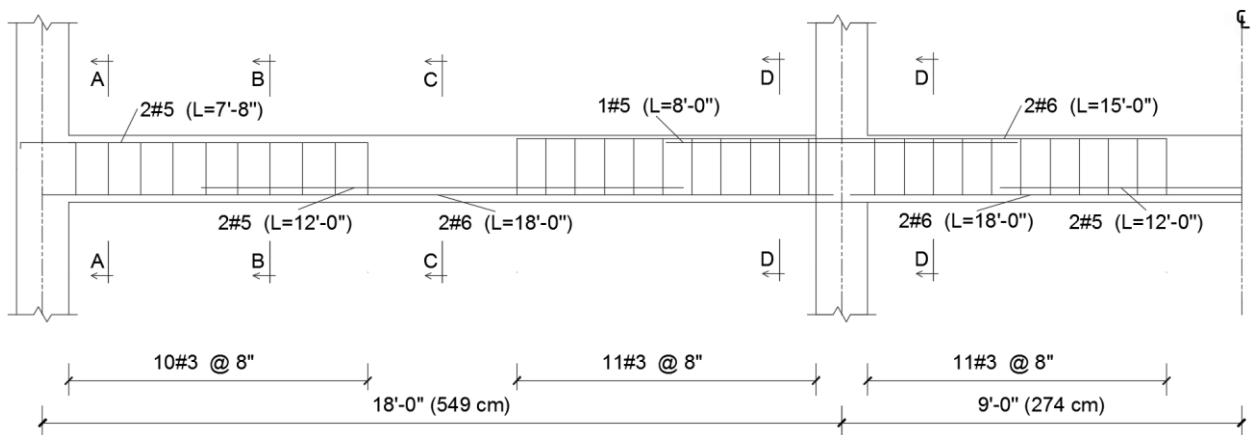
Beam reinforcement profile (symmetric) (Bracci et al. 1992).
